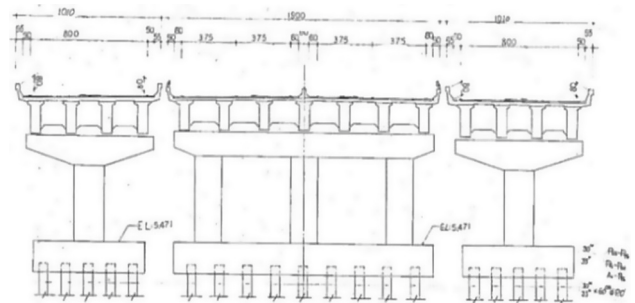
Cross-sectional view of the Shi-Bin Bridge.
